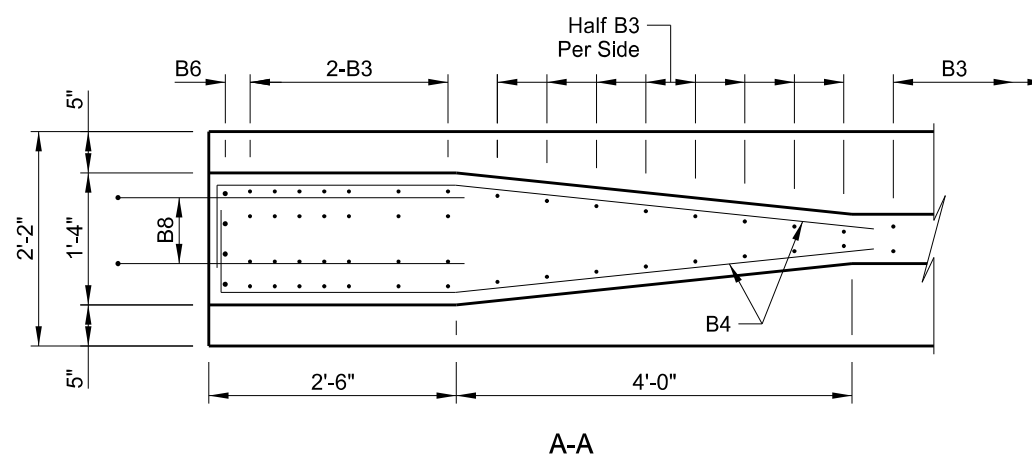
(DETAILS NOT SHOWN ARE SAME AS "SECTION @ ϕ ")
